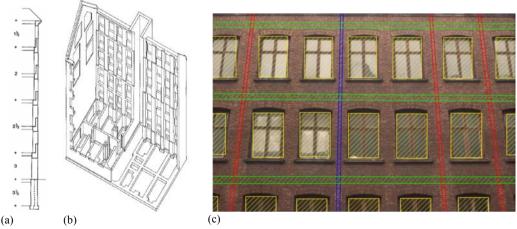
(a) Thickness of wall columns in bricks. [9] (b) Maximum penetration of outer leaf. [9] (c) Exterior view of building (original photo by J. Engelmark).
